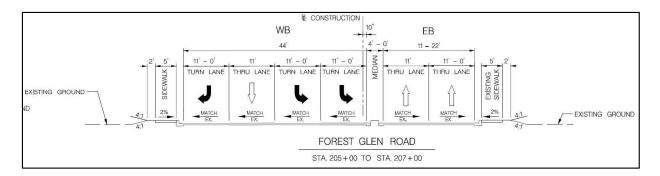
Proposed Cross Section – Forest Glen Road (East Side of MD 97)
